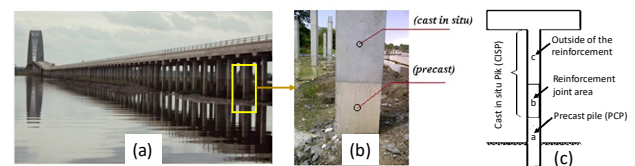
Study site in (a) Bridge Column in Kutai Kertanegara Regency, East Kalimantan, (b) precast and cast in situ position, (c) diagram of column structure
